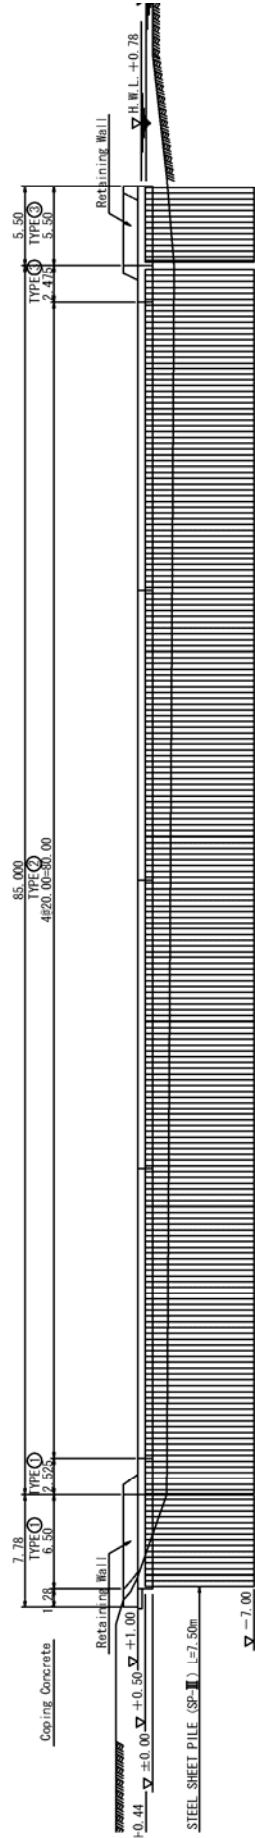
Steel Sheet Pile Arrangement
